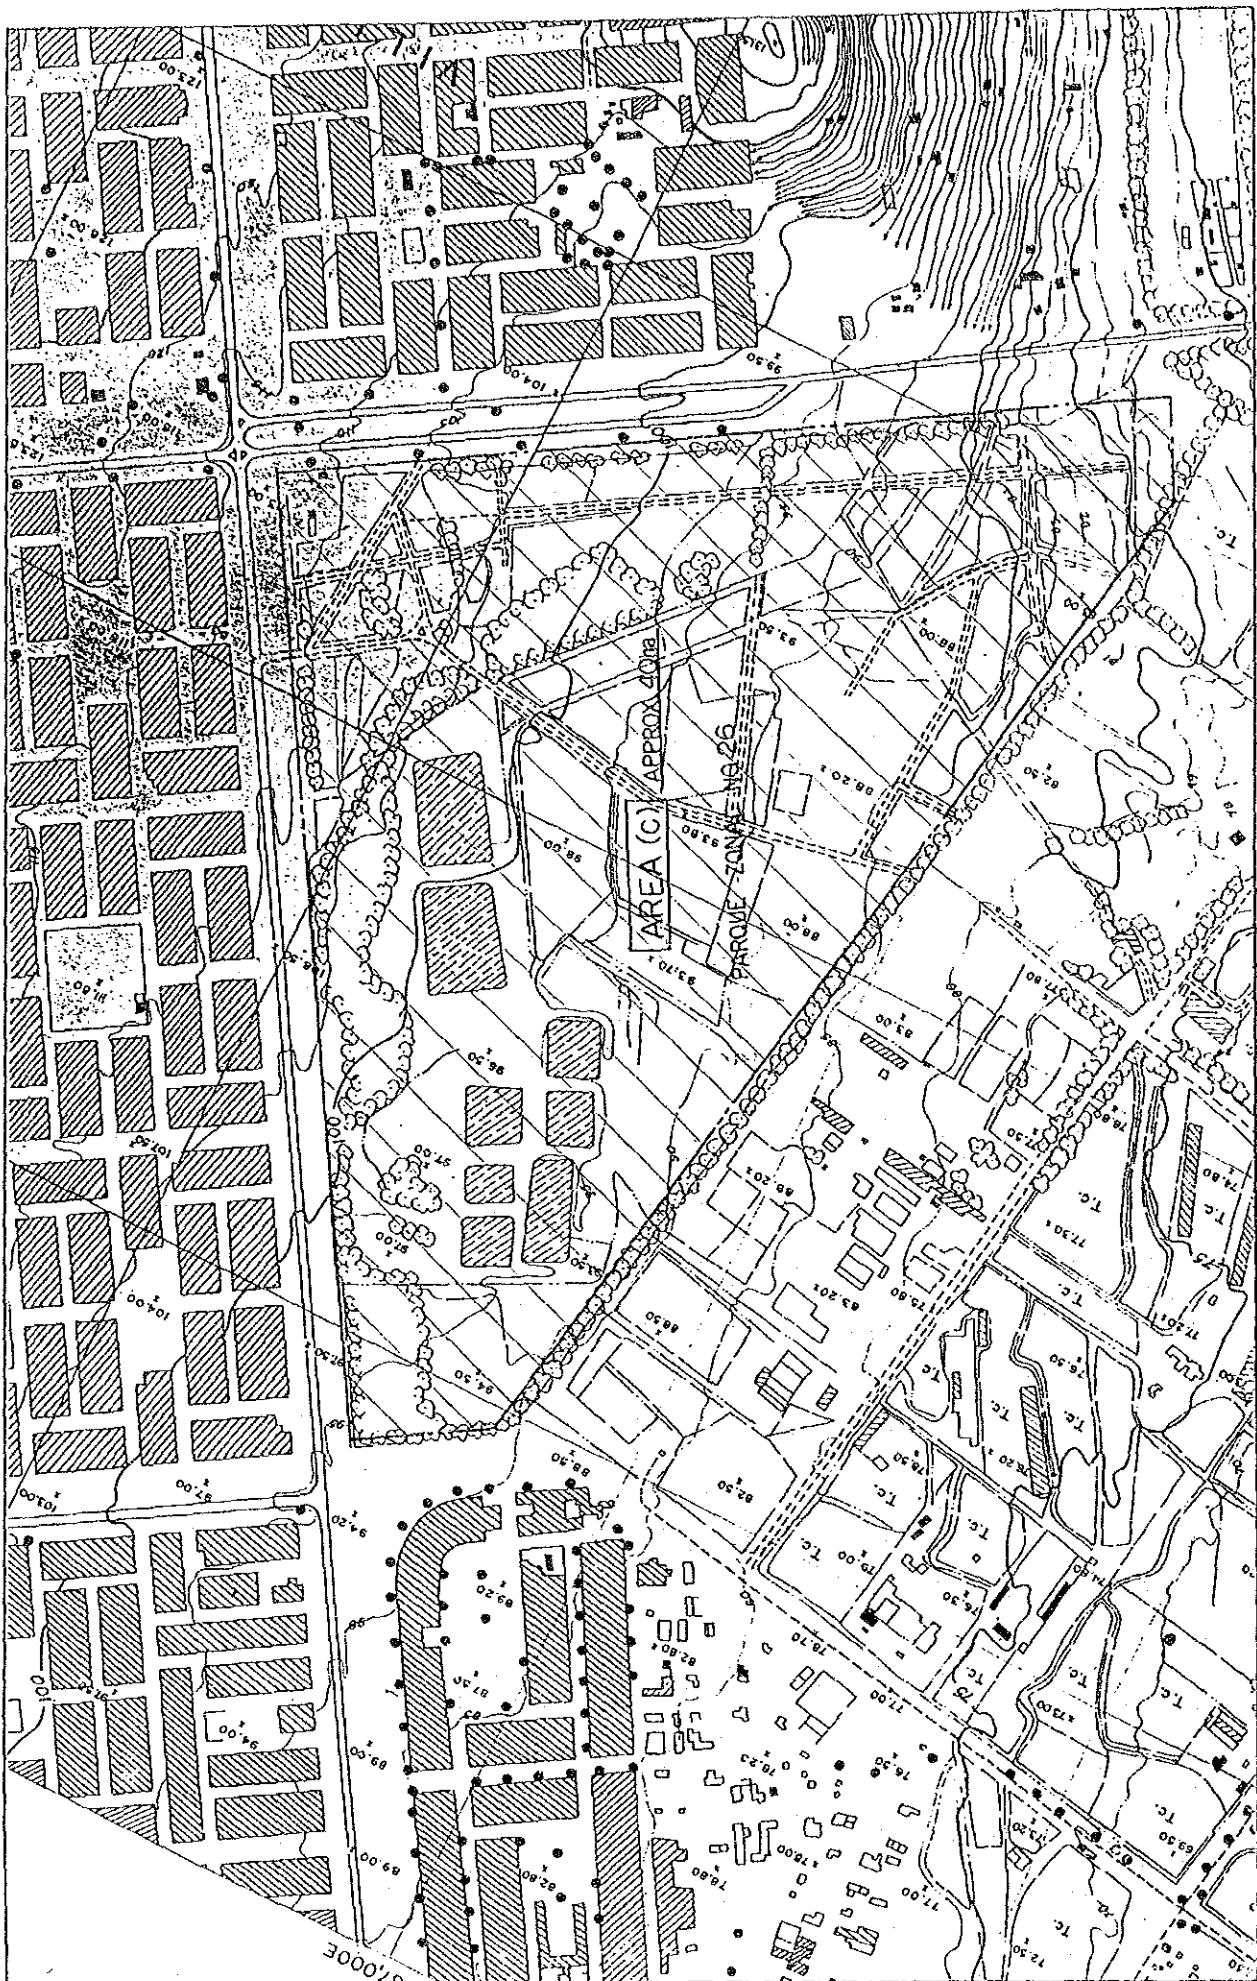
PROPOSED AREA (C) FOR SEWAGE TREATMENT PLANT, PARQUE ZONA NO 26, VILLA EL SALVADOR.
